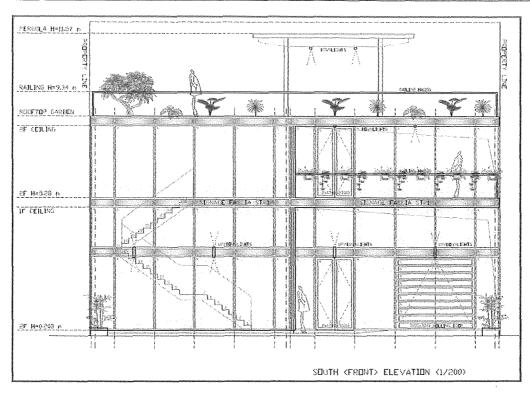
Proposed South view of the expanded light industral facility proposed for 1036 Seamount Way, Gibsons, BC. Source: Joe Oteruelo.
